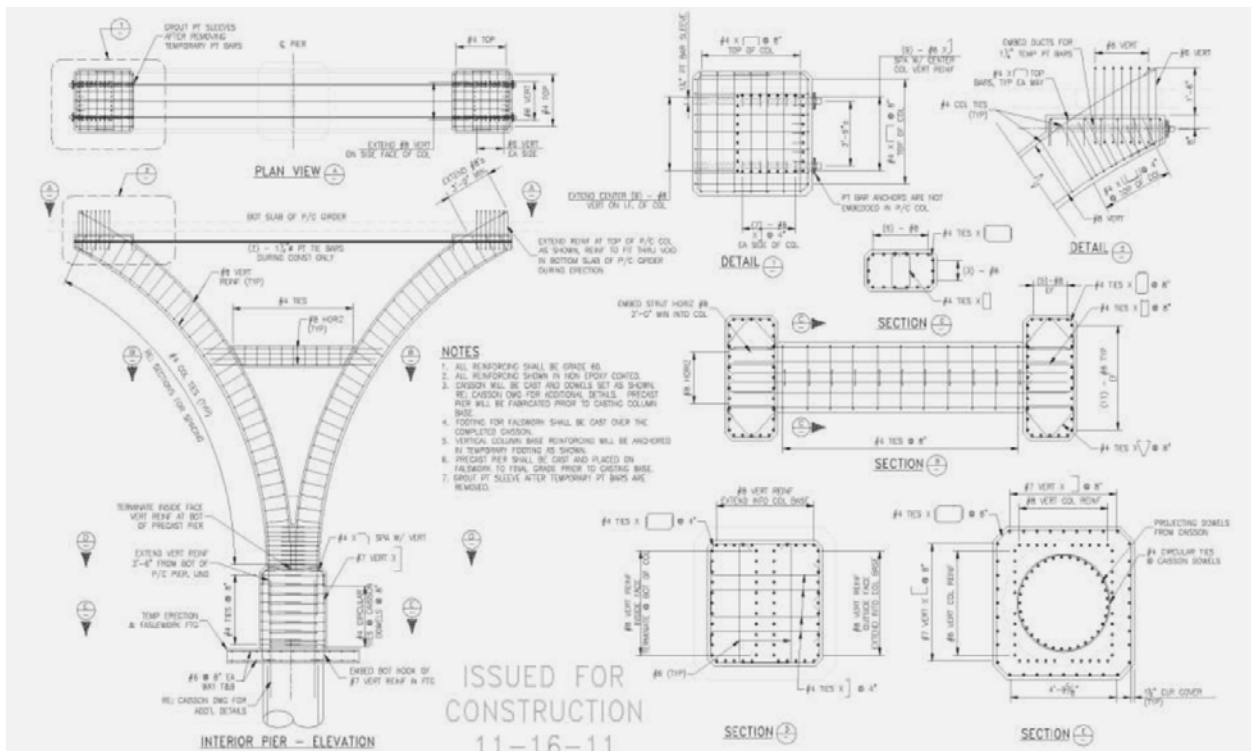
Drawing. Reinforcement details for pier (courtesy: Colorado DOT).
